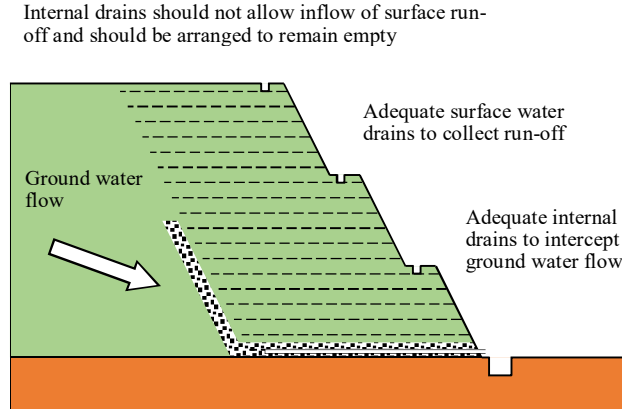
Drainage features for a reinforced soil slope built against an existing hillside
